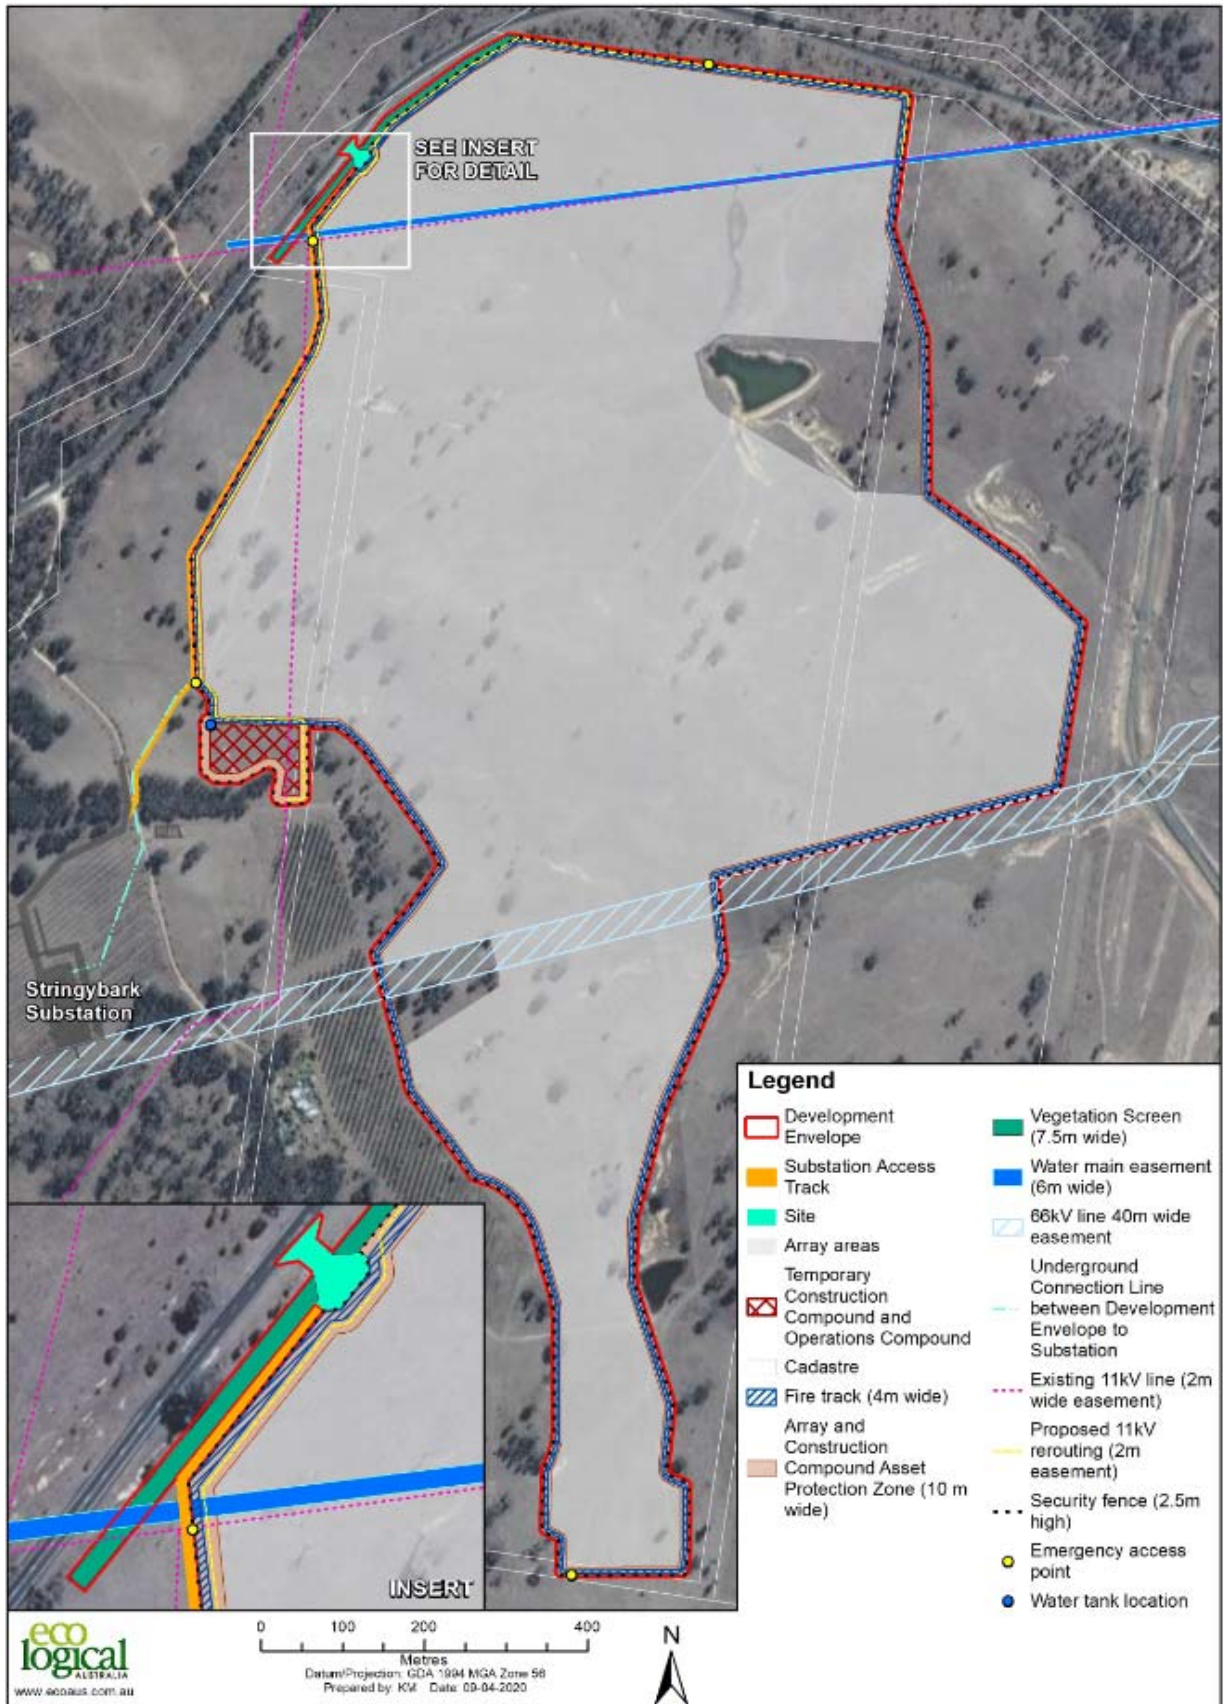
Revised Site Plan for Olive Grove Solar Farm
